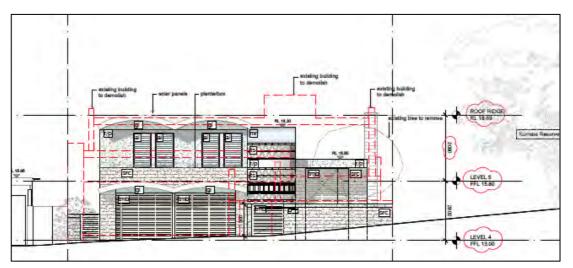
North Elevation (extract from DA12 A) Source: Source: Luigi Rosselli
